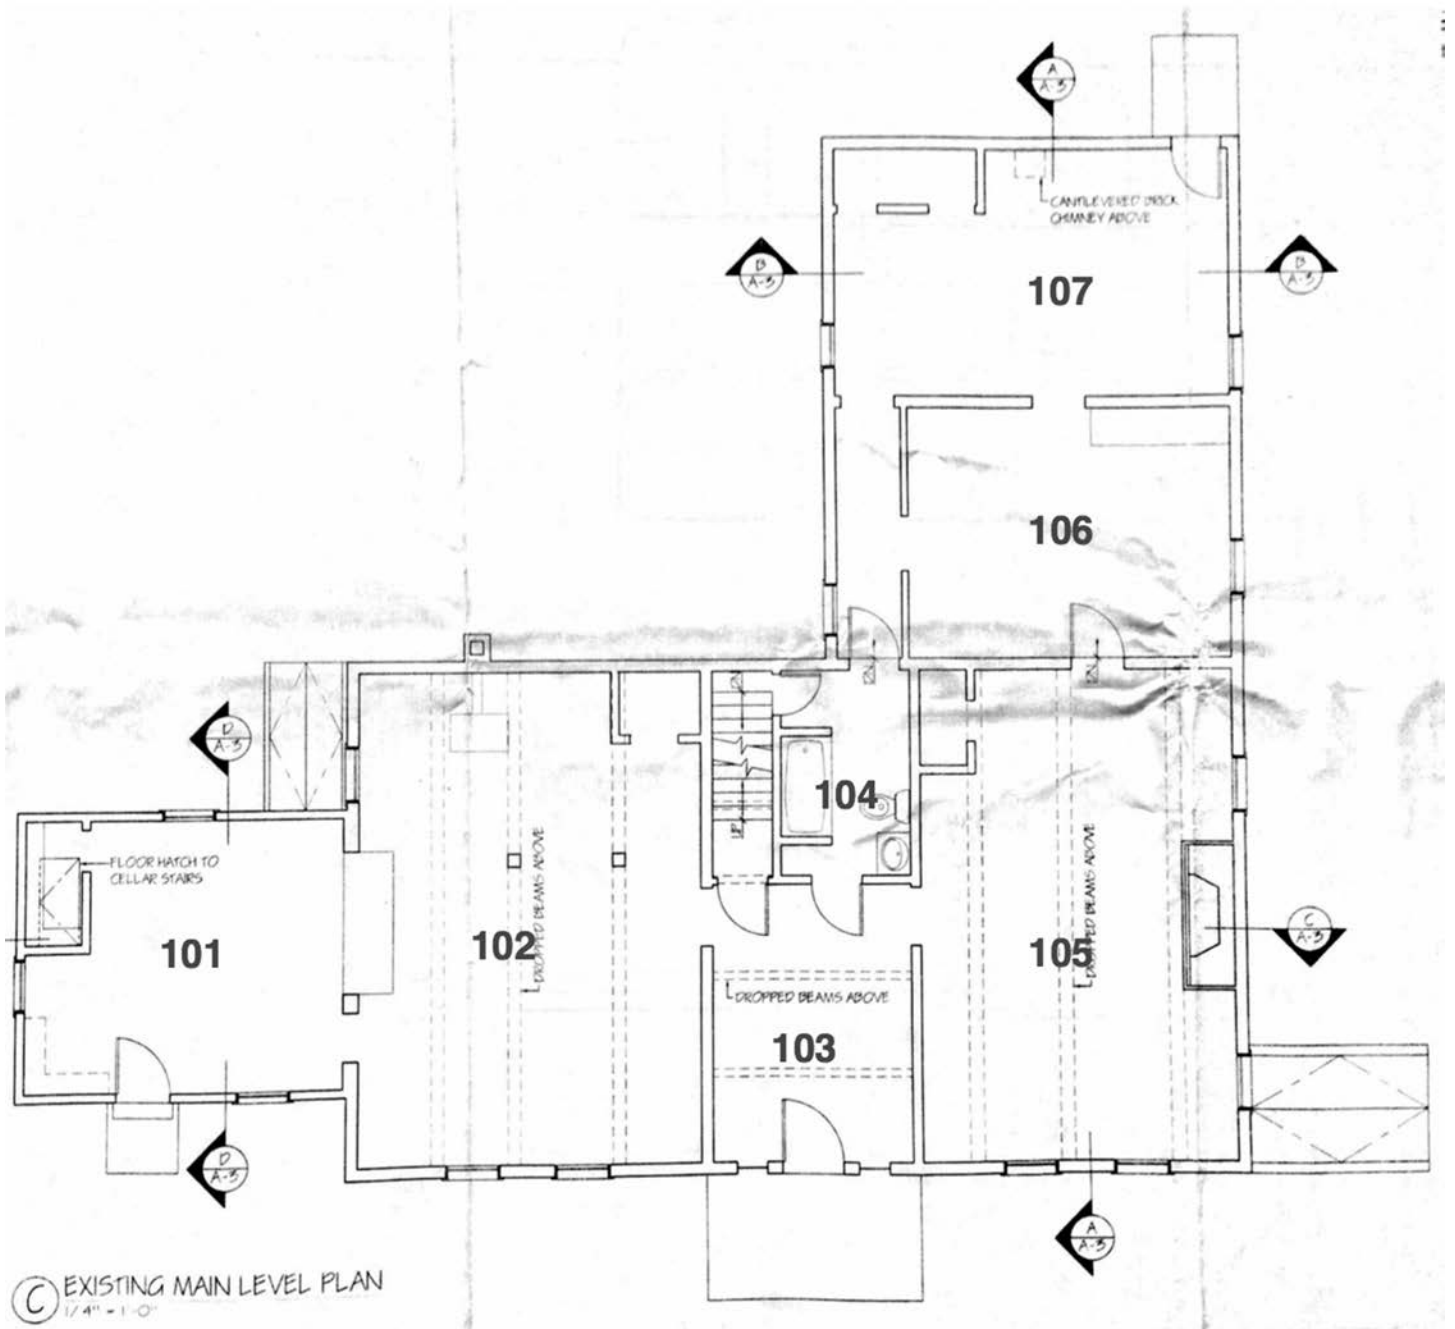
First floor plan. Drawing by Diane Reimer, 2004.
